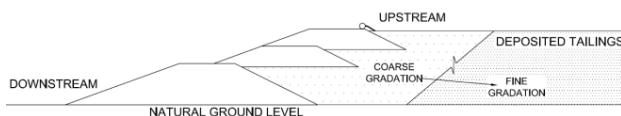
Typical section of upstream embankment construction for above ground 'paddock' type TSF.
